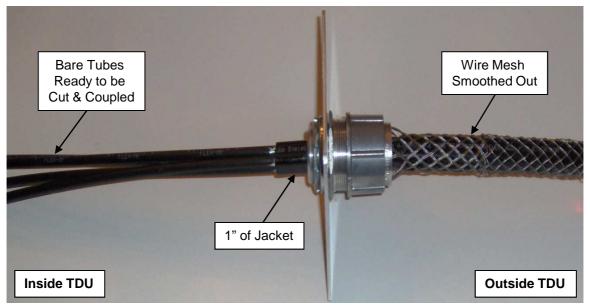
Kellems Grip Installed and Tube Cable Ready for Coupling
